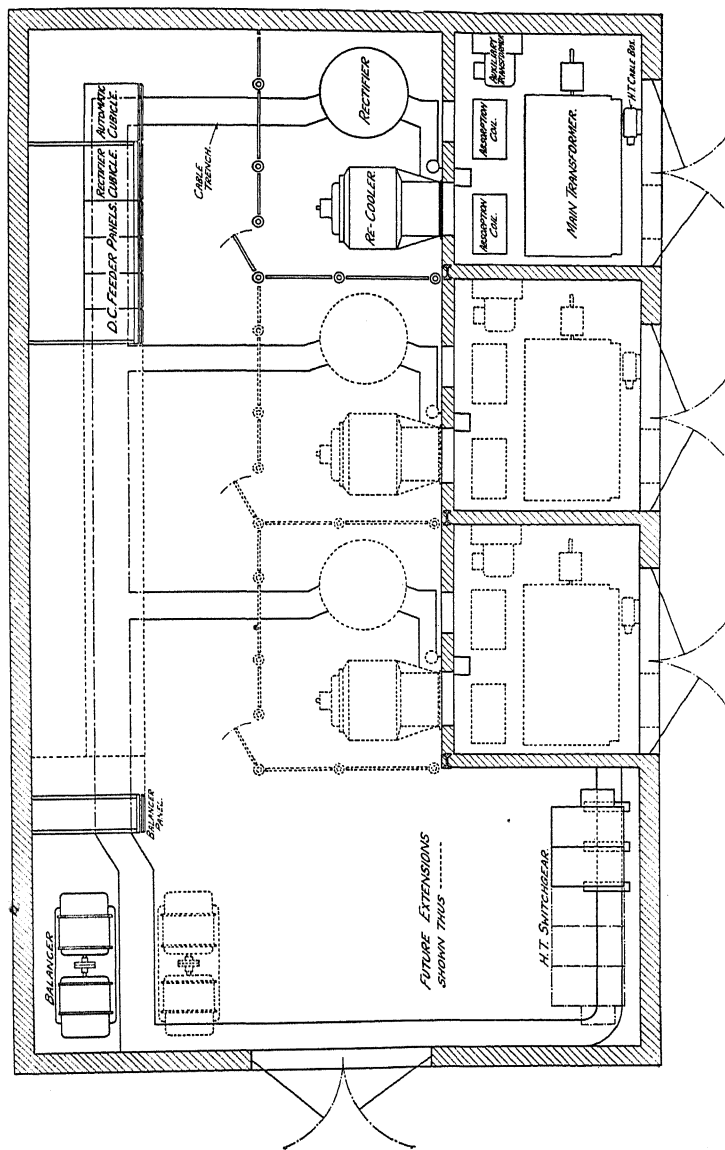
PLAN VIEW OF RECTIFIER SUBSTATION
